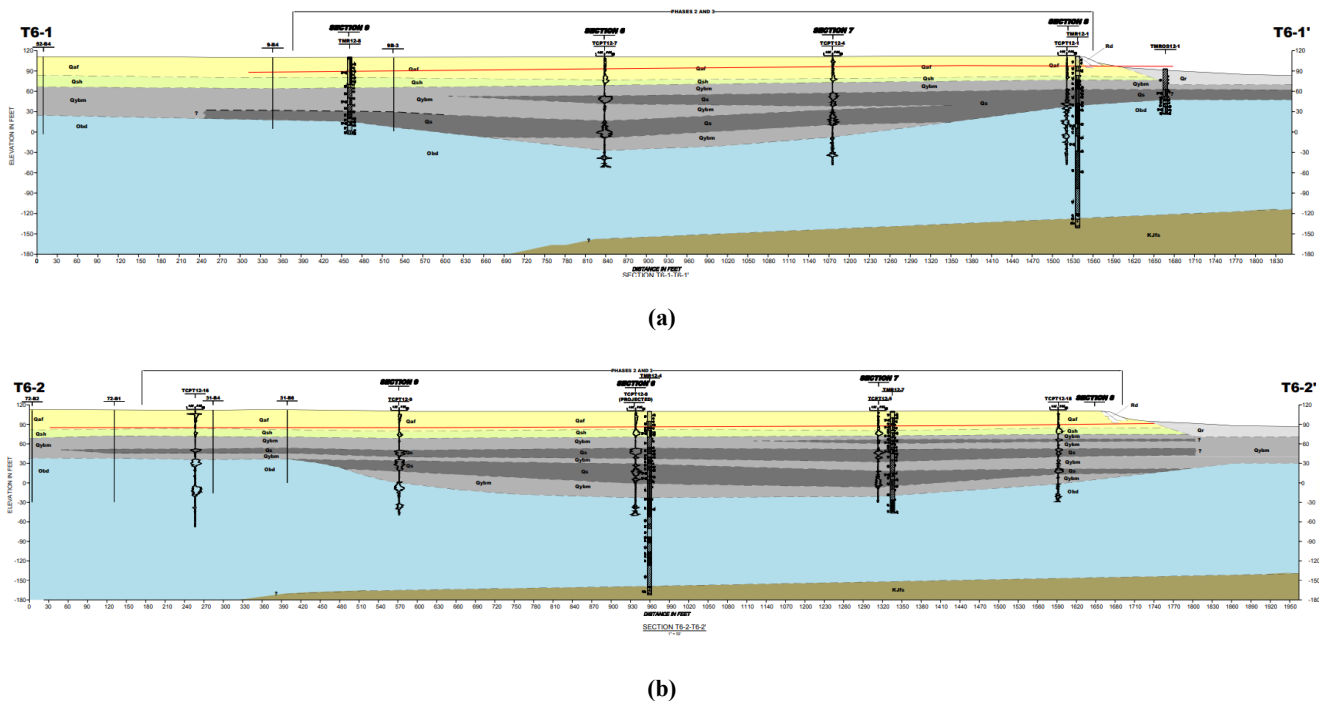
Cross sectional profiles of sections T6-1 and T6-2. Note that the elevation datum applied to the cross sections is the North American Vertical Datum of 1988 (NAVD88) plus 100 feet.
